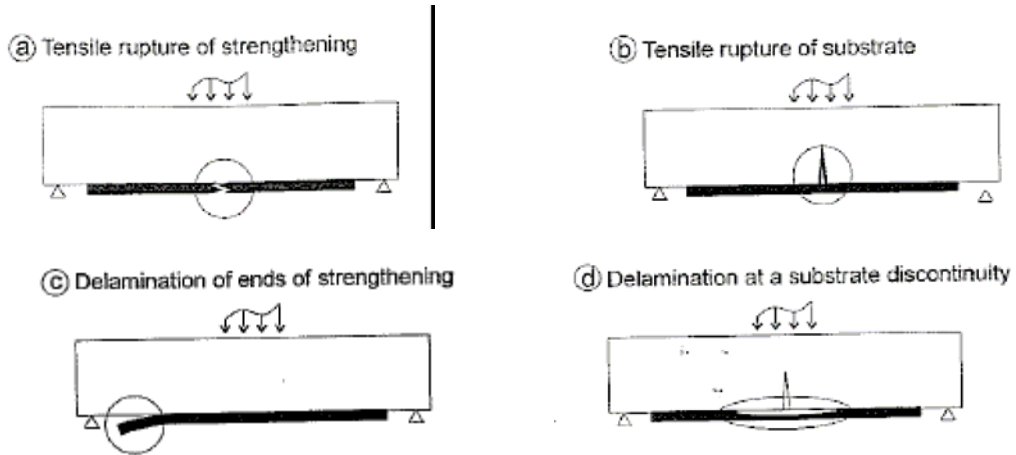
Failures in Steel beam strengthened with CFRP [9]
